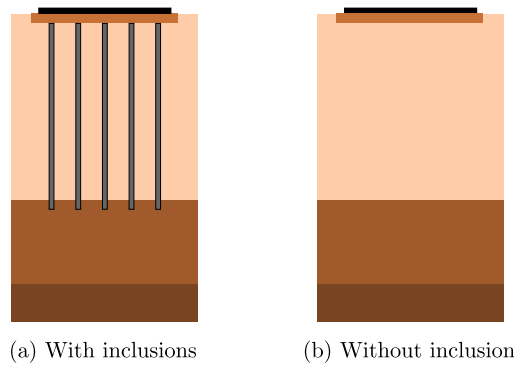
Configuration of foundation: (a) with reinforcement and (b) without reinforcement
